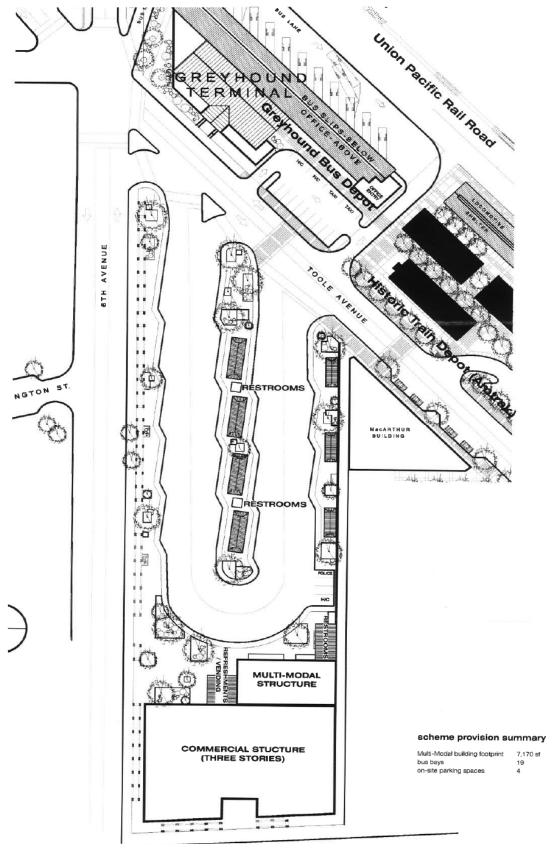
Potential RTC Redevelopment Plan (2005 Burns Walk Hopkins)
